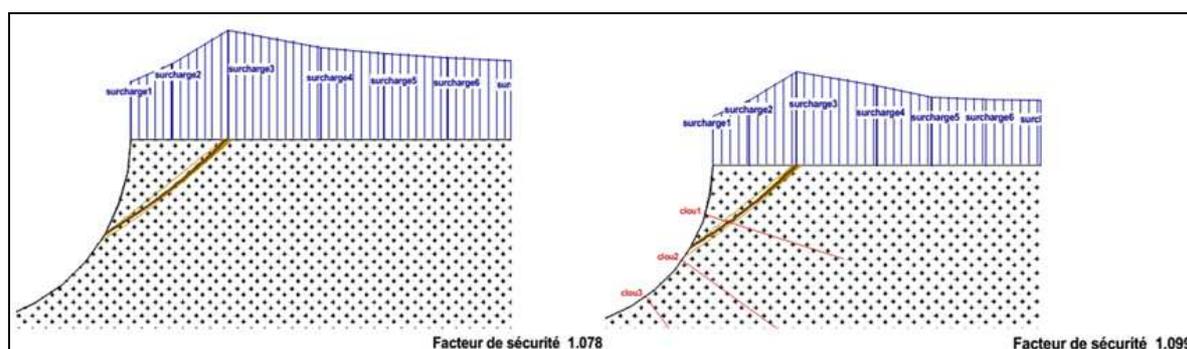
Global stability of a non reinforced and a rock-bolted section away from the tunnel head, GEOSTAB ©
